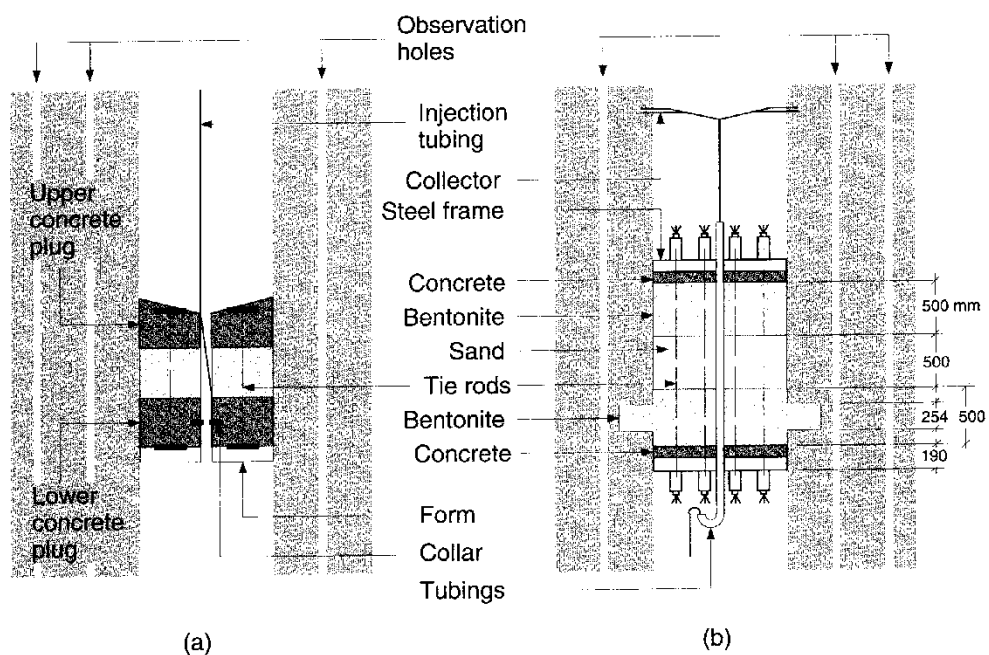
Longitudinal cross sections of (a) the concrete , and (b) the bentonite shaft plugging tests.
